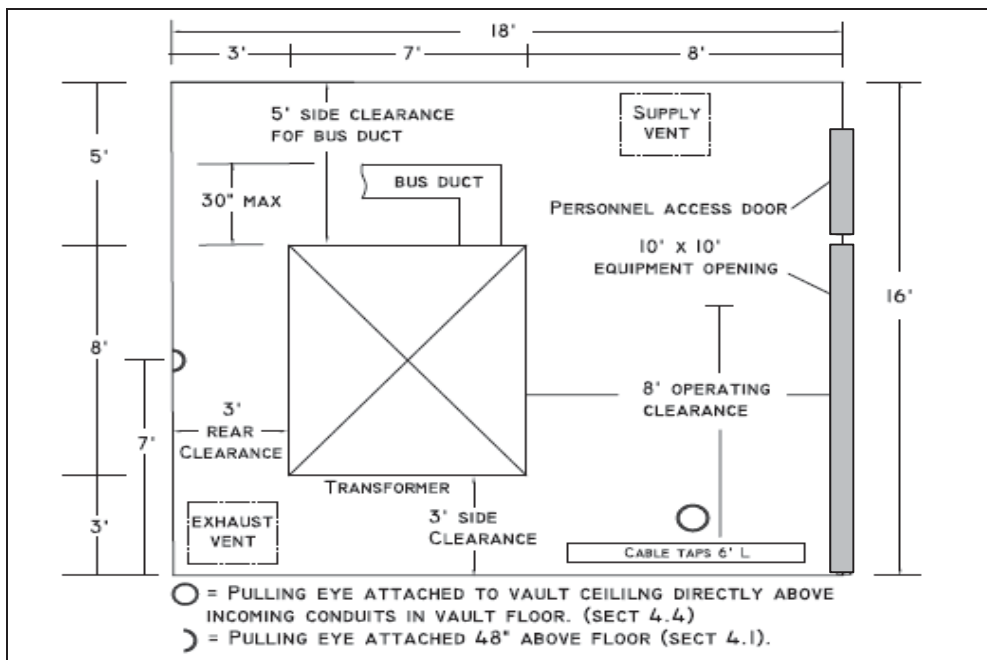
Typical arrangement of vault room in relation to equipment and personnel access opening.
